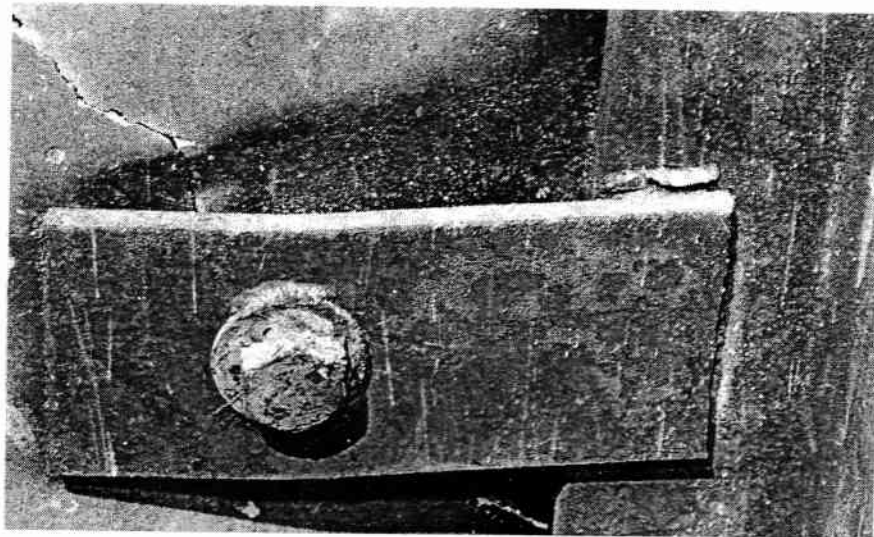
Plate joining the columns to the tilt slabs showing weld separation under heat load and cracking of slab behind bolt as tilt slab deflects.
